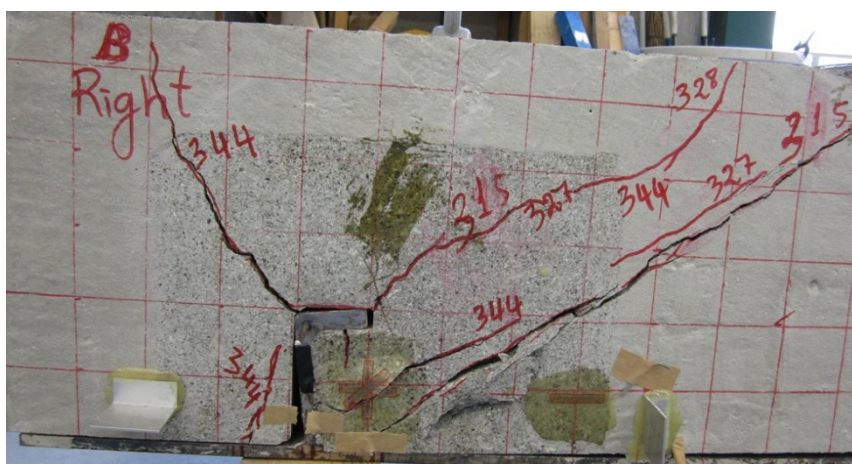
Specimen S-300-100-9-41.5-25 at failure
